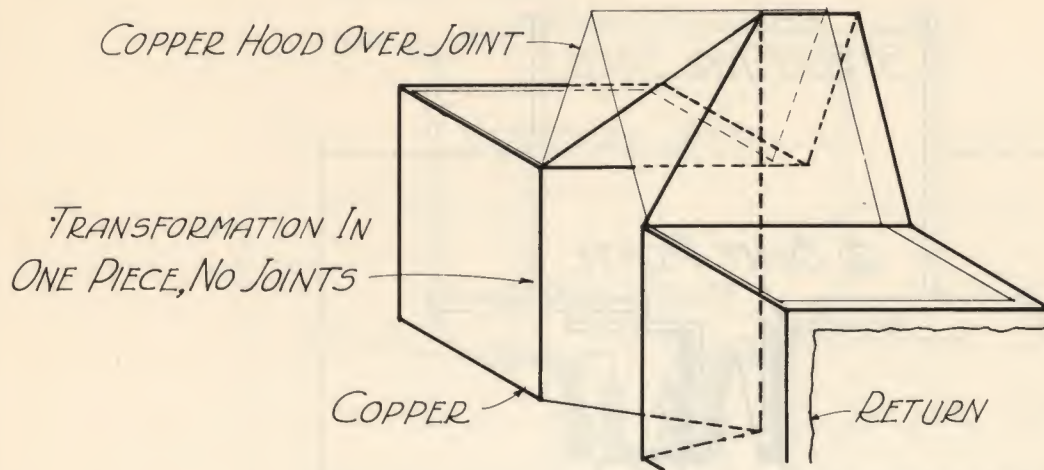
shows the installation of water stop units in expansion joints at corners and in straight walls of masonry construction. Units are formed in 8-ft. lengths and should run continuously from the footing to the eave or top of the parapet. Above grade the end joints should be soldered. Each flange on the unit should be built into the masonry joints not less than 4 inches. Premolded fillers or strips of compressible filler are used in place of mortar in the through joints. The mortar joint parallel to the di-
